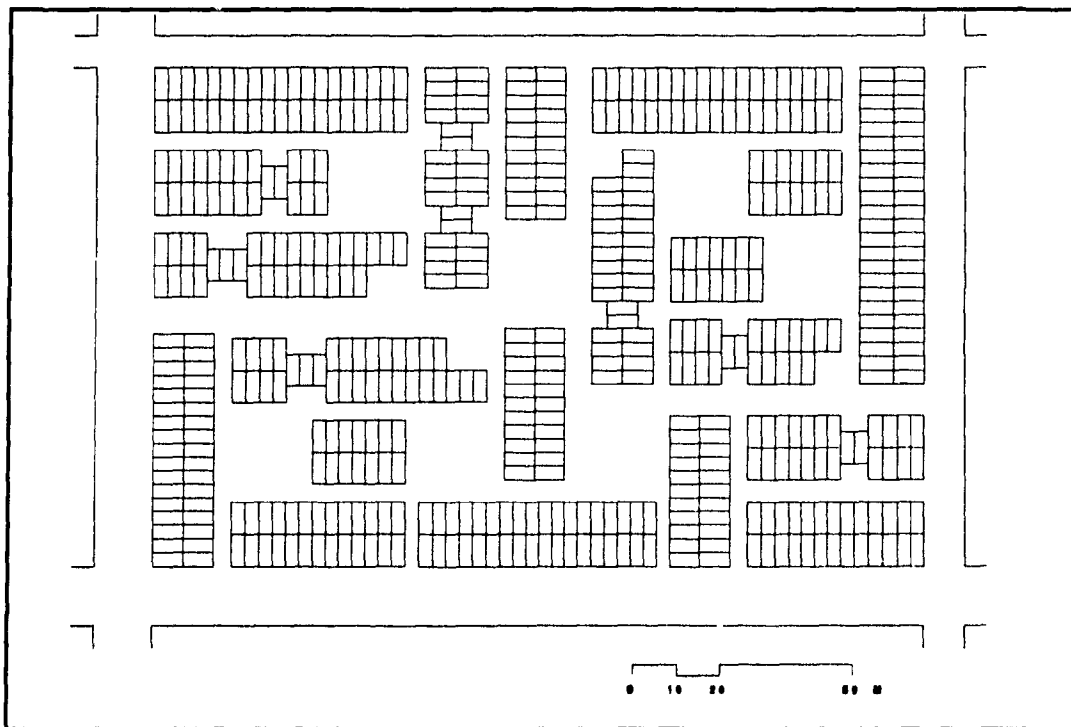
PLOT LAYOUT - ALTERNATIVE 3
